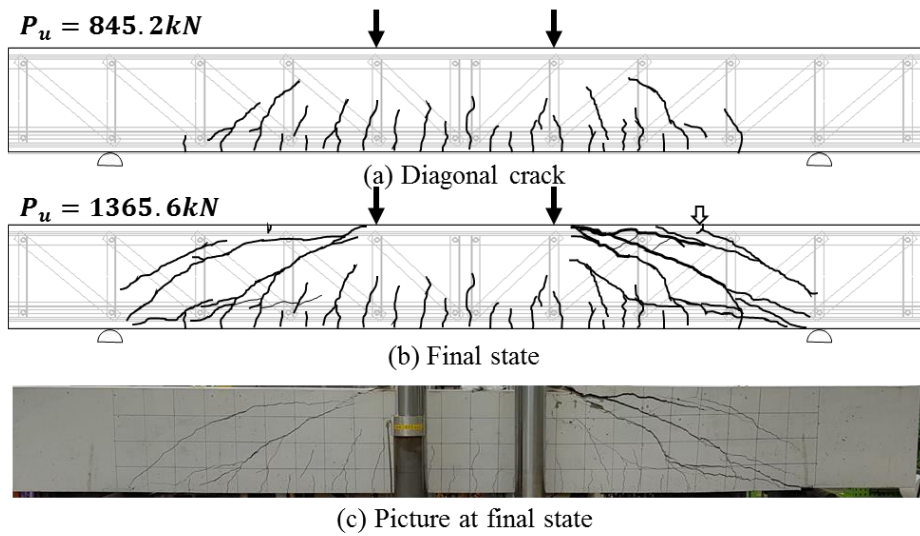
Failure mode and crack pattern of RC-S2 specimen
